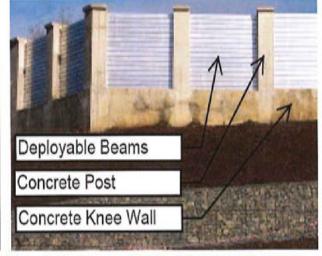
Semi-permanent wall with beams installed (Source: EKO)
